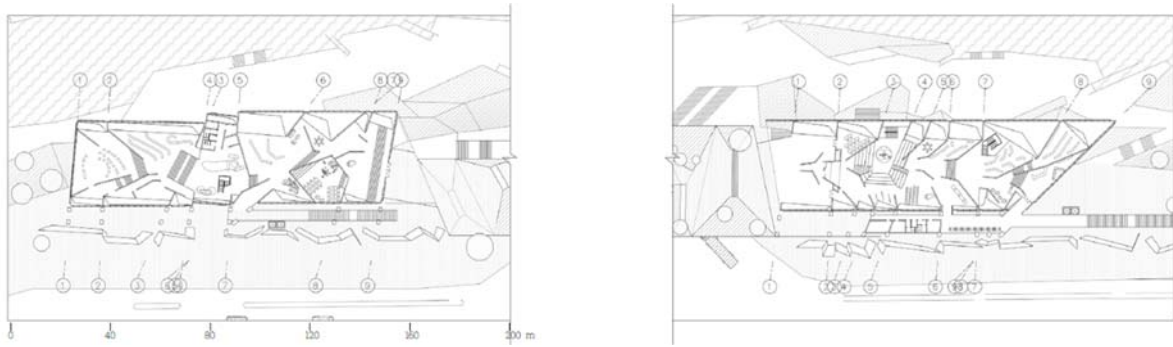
Building first floor plan (Image source: author's own drawing)
